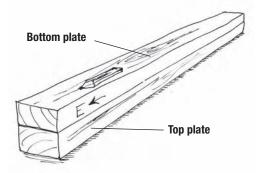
Marking the sides of the bottom wall plates to assist in the relocation of the wall onto the floor for assembly
